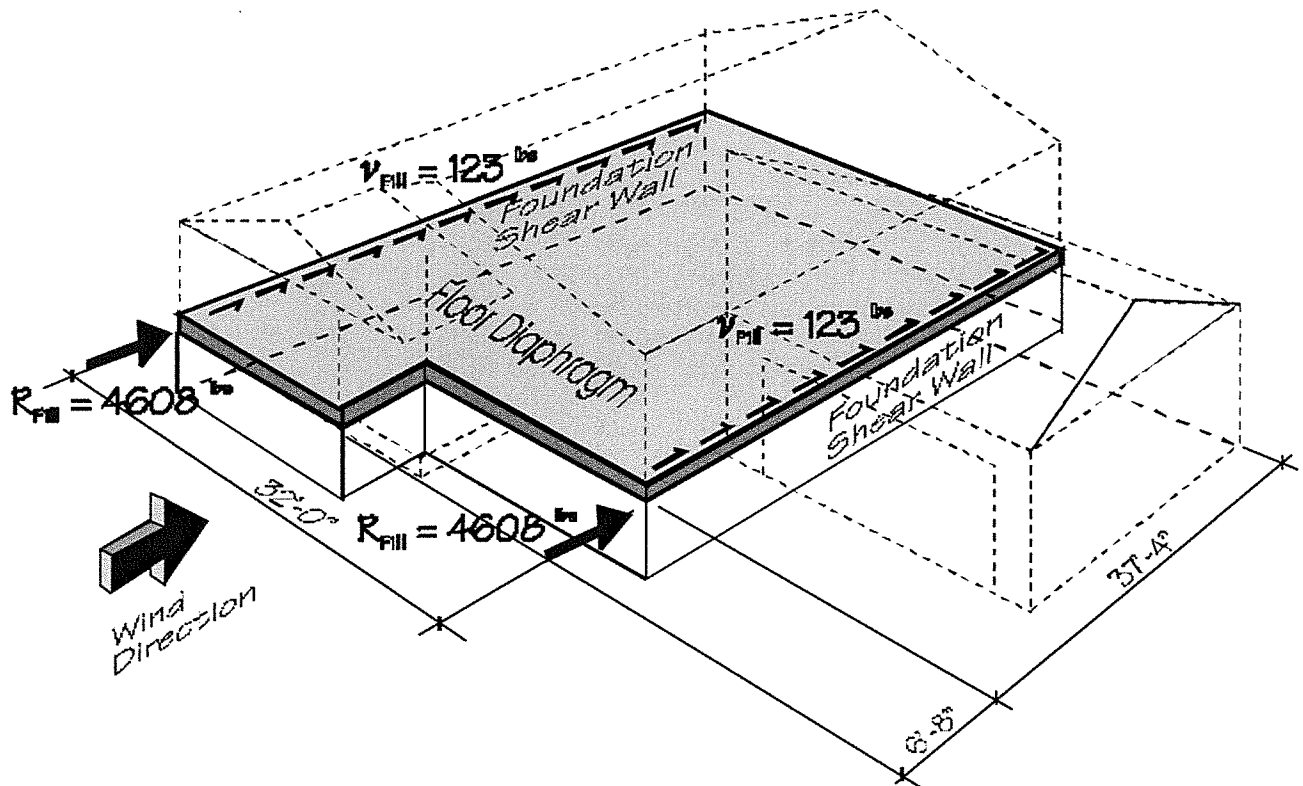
Perspective of One Story Residence Floor Diaphragm Reaction and Shear
